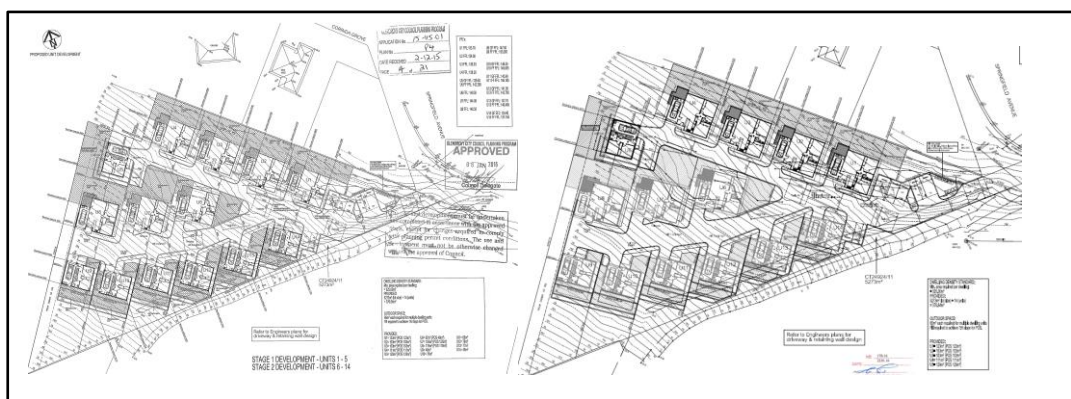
Approved Plan Planning PLN-15-115.01 and Building BP 16/0022 (5 Dwellings)
